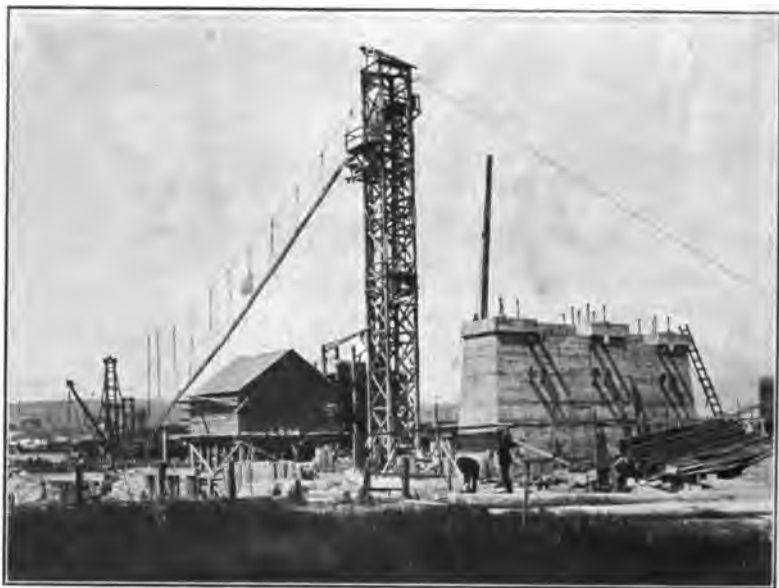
SALMON BAY PIERS, N. P. RY.
